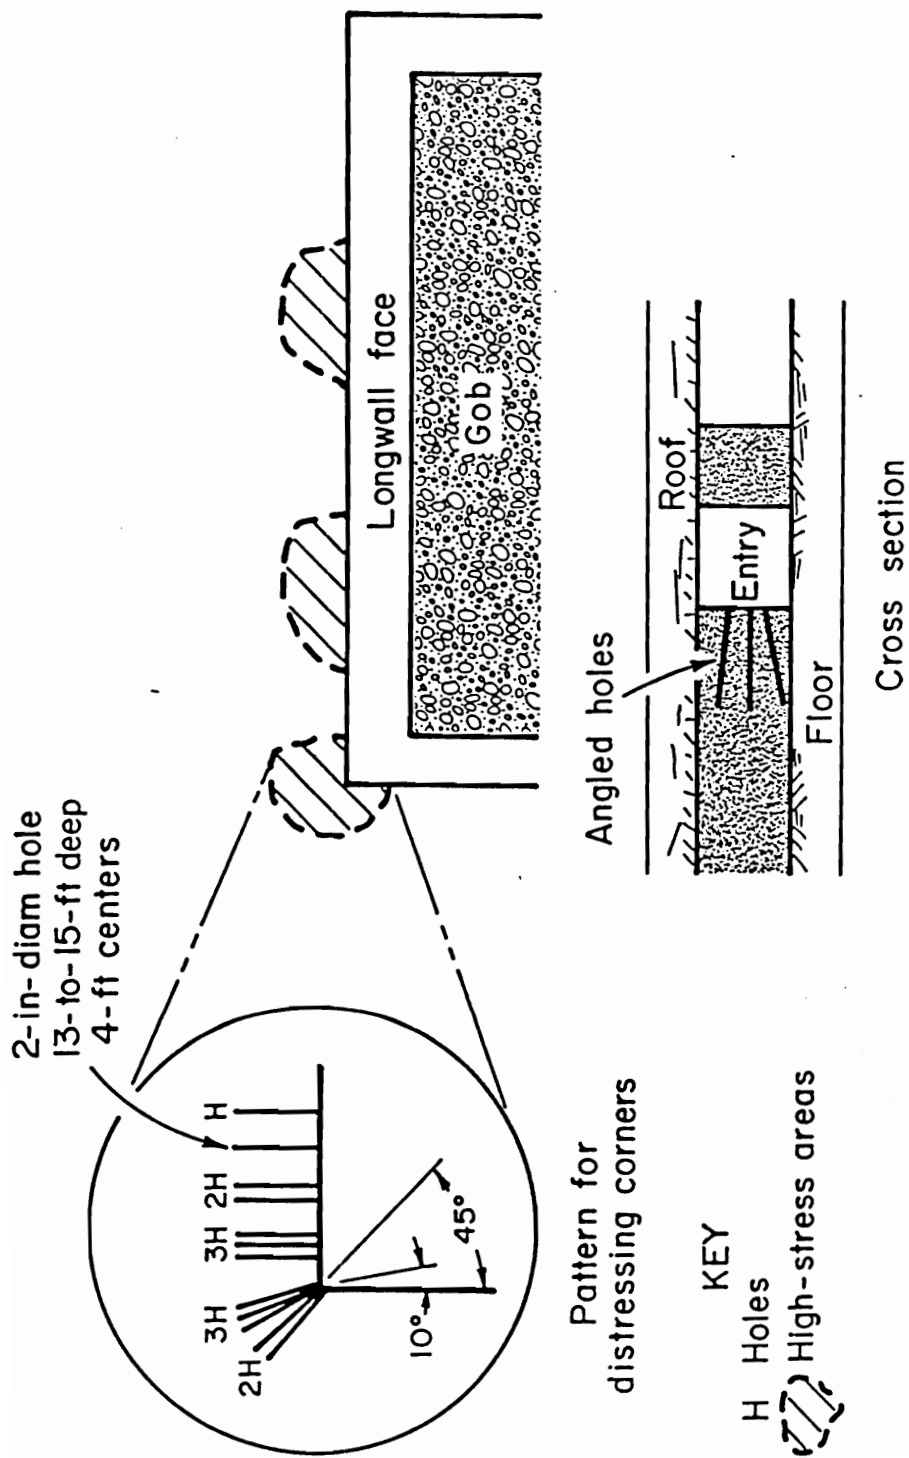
Volley firing drill hole pattern for longwall face and corners (After Haramy and McDonnell, 1988).
